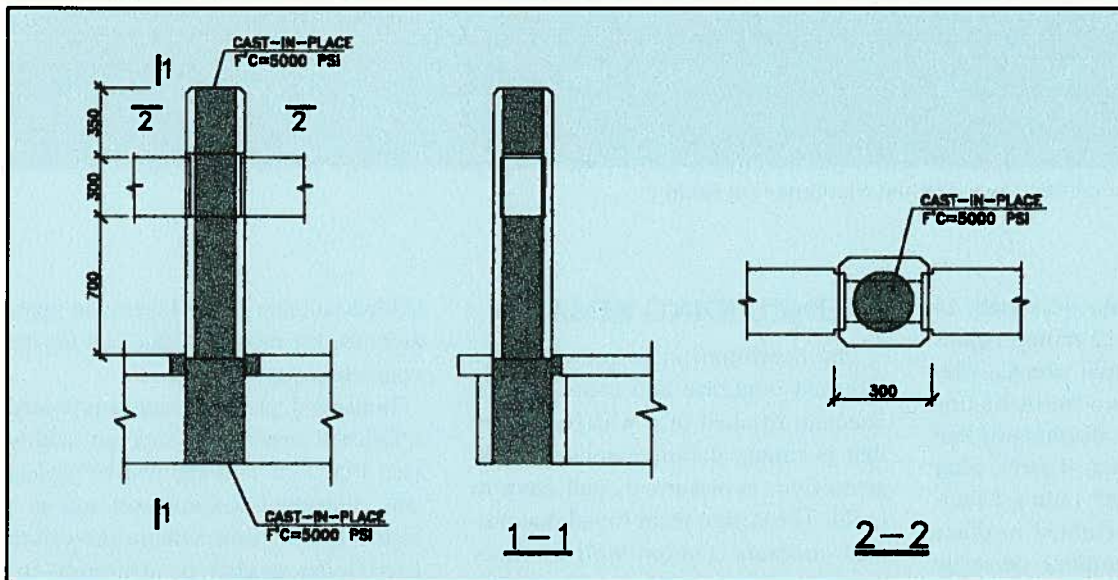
Connection detail of railing columns, railing beams, and main beams.
